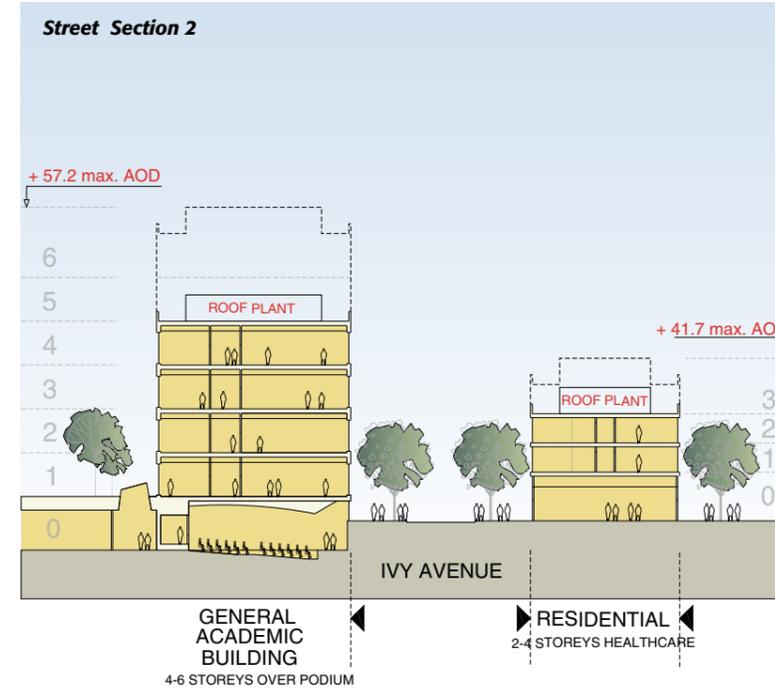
Section 2 illustrates a section along Ivy Avenue, again through the general academic building shown in Figure 4.8 and a 2-4 storey healthcare building on the north side of the Avenue. Figure 4.6 establishes that the buildings will be a maximum of 57.2 and 41.7 metres above ordnance datum respectively, including any rooftop plant.
